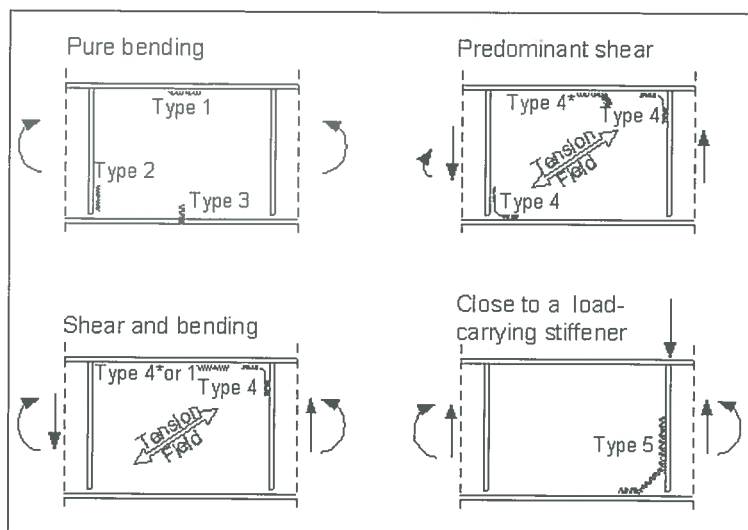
Typical fatigue cracks observed in plate girders with slender webs.
